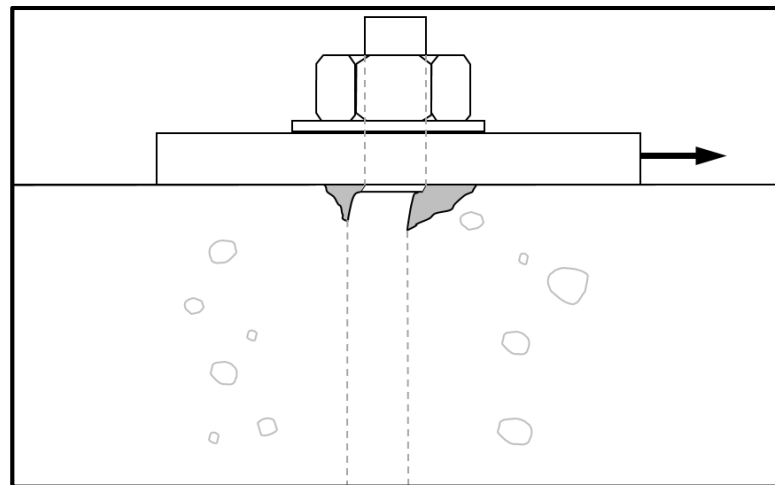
Illustration of steel shear failure of an anchor bolt in a flush-mounted base plate
